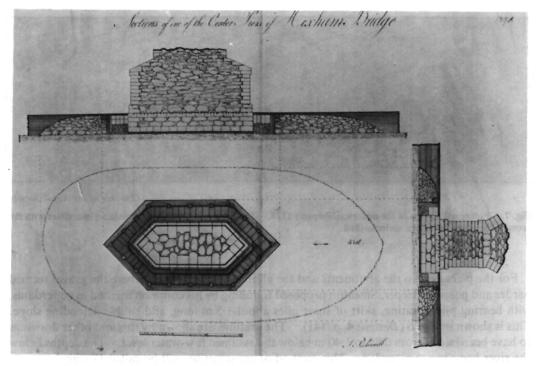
Pickernell's drawing of a pier as built 1779 (Design 3)
